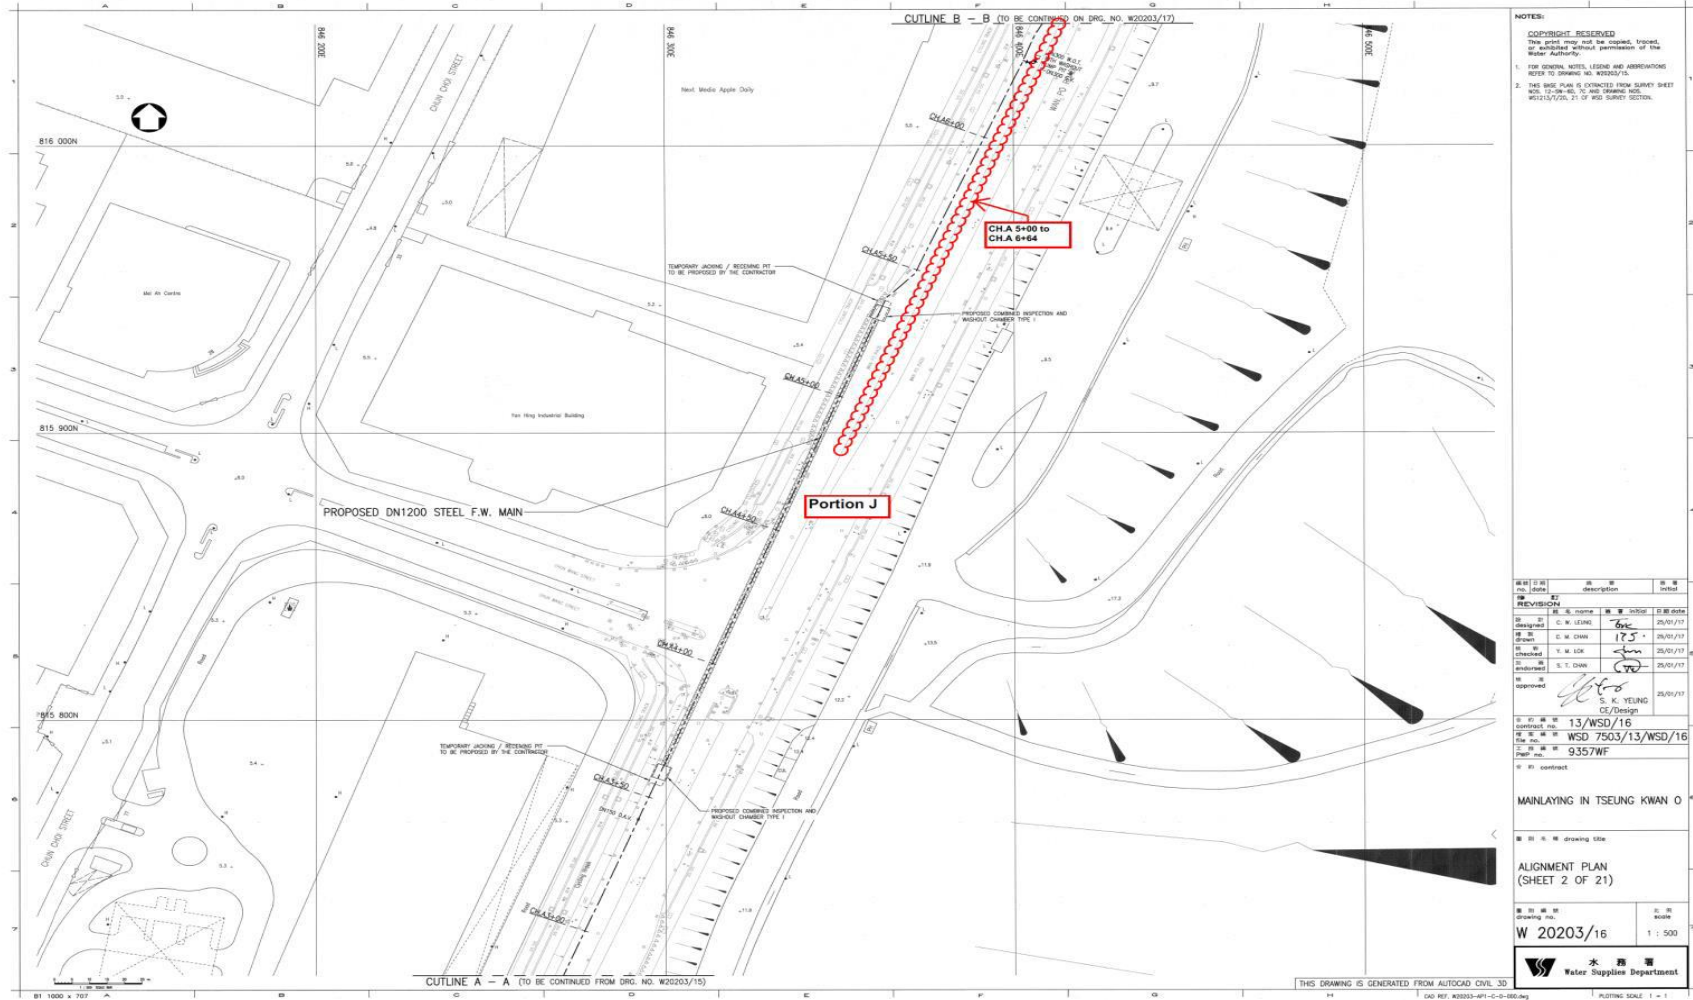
Location Plan for Portion J - CH.A 5+00 to CH.A 6+64
